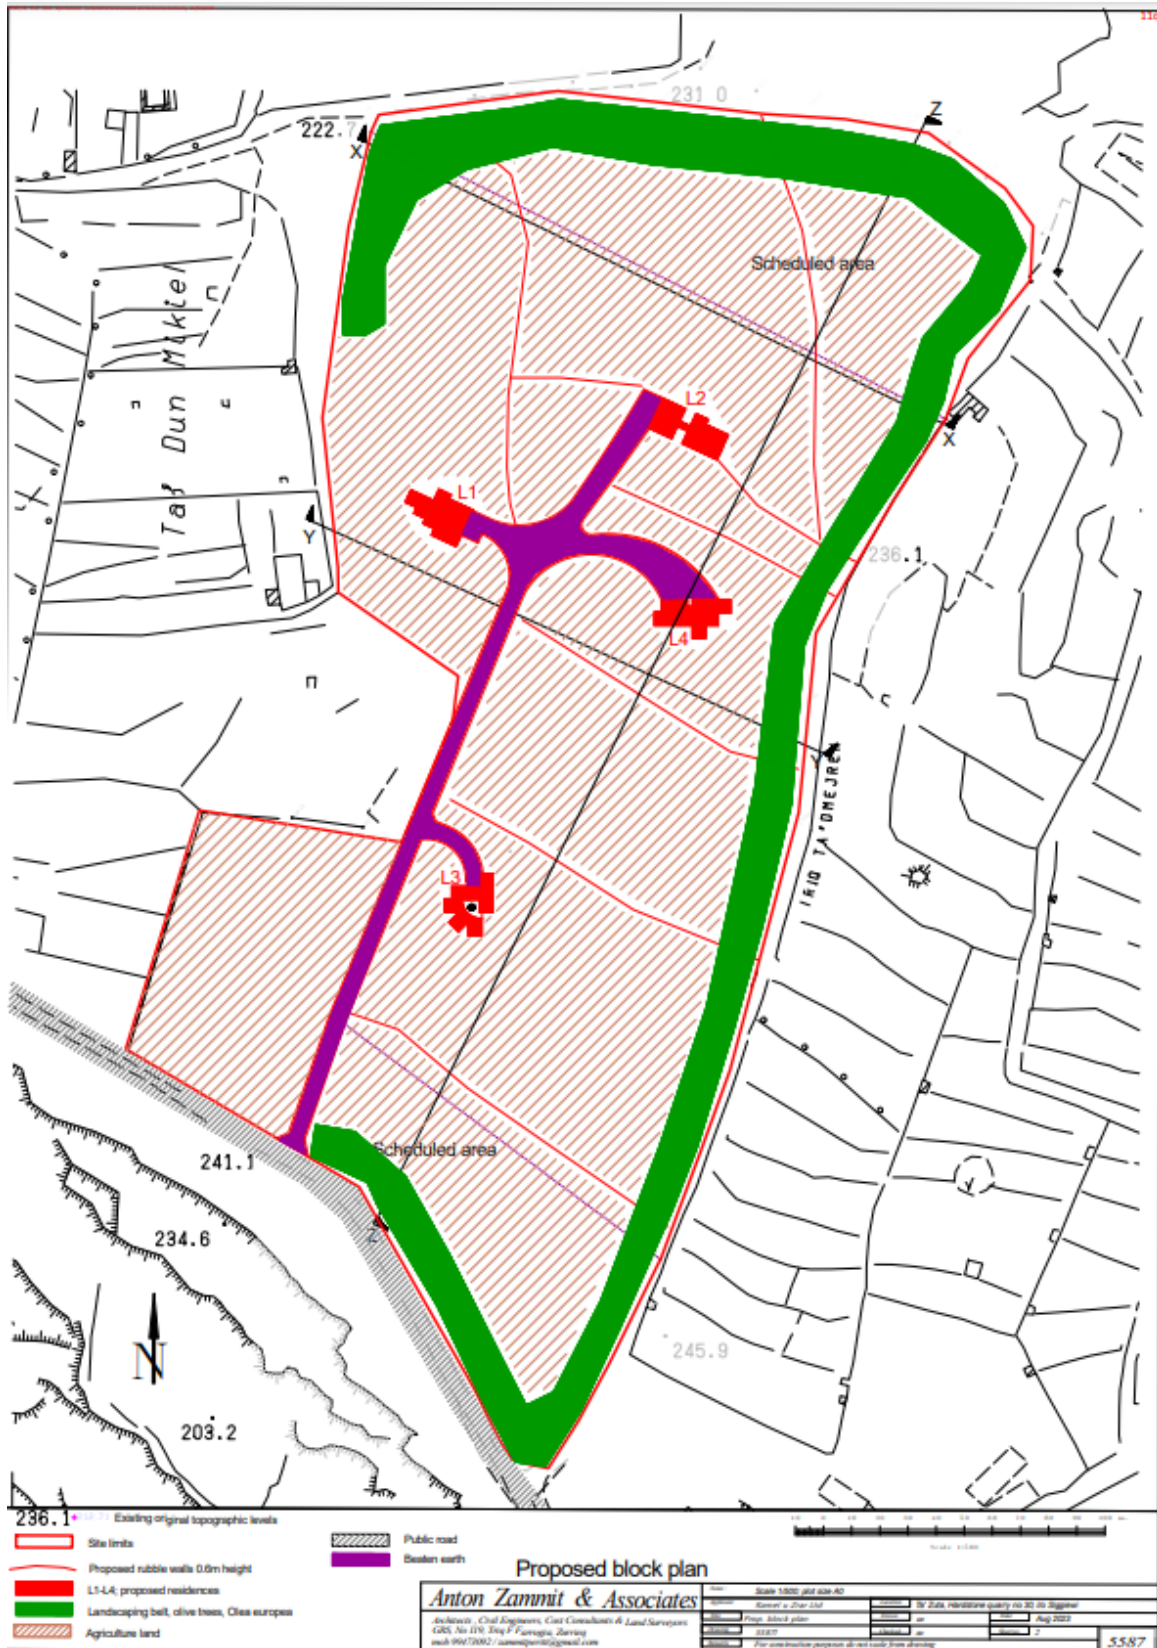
Proposed block plan. Source: E-Apps PA 07562/23 Doc 11d.
